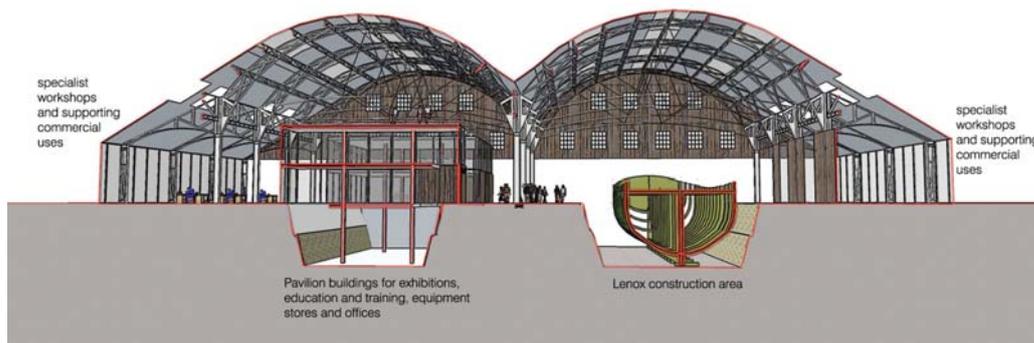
The Olympia Shed Section as proposed by The Lenox Project showing the Lenox under construction and Deptford Dockyard Museum.
